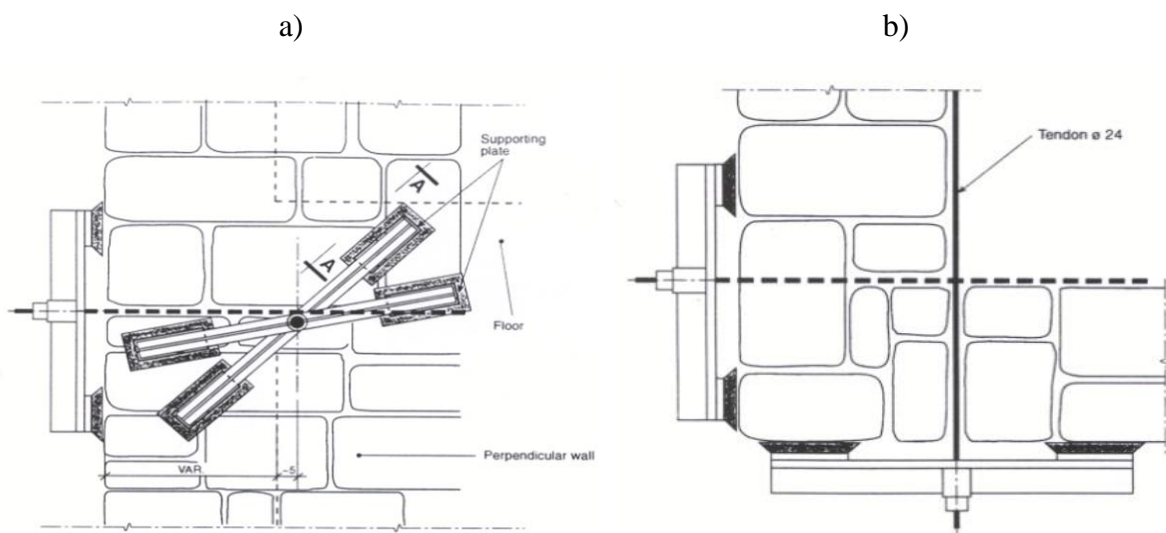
View of anchorage system: a) front view, b) horizontal section (Source FEMA 547)
